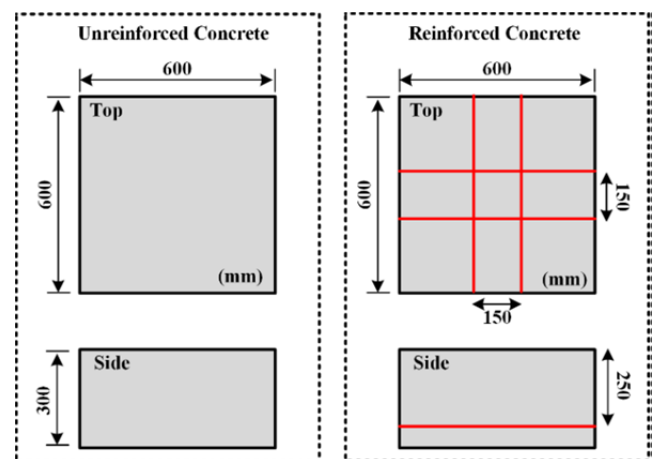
Blueprints of unreinforced and reinforced concrete. The same mix proportioning is used for both unreinforced and reinforced concretes and the diameter of the used steel rebars is set at 15 mm.
